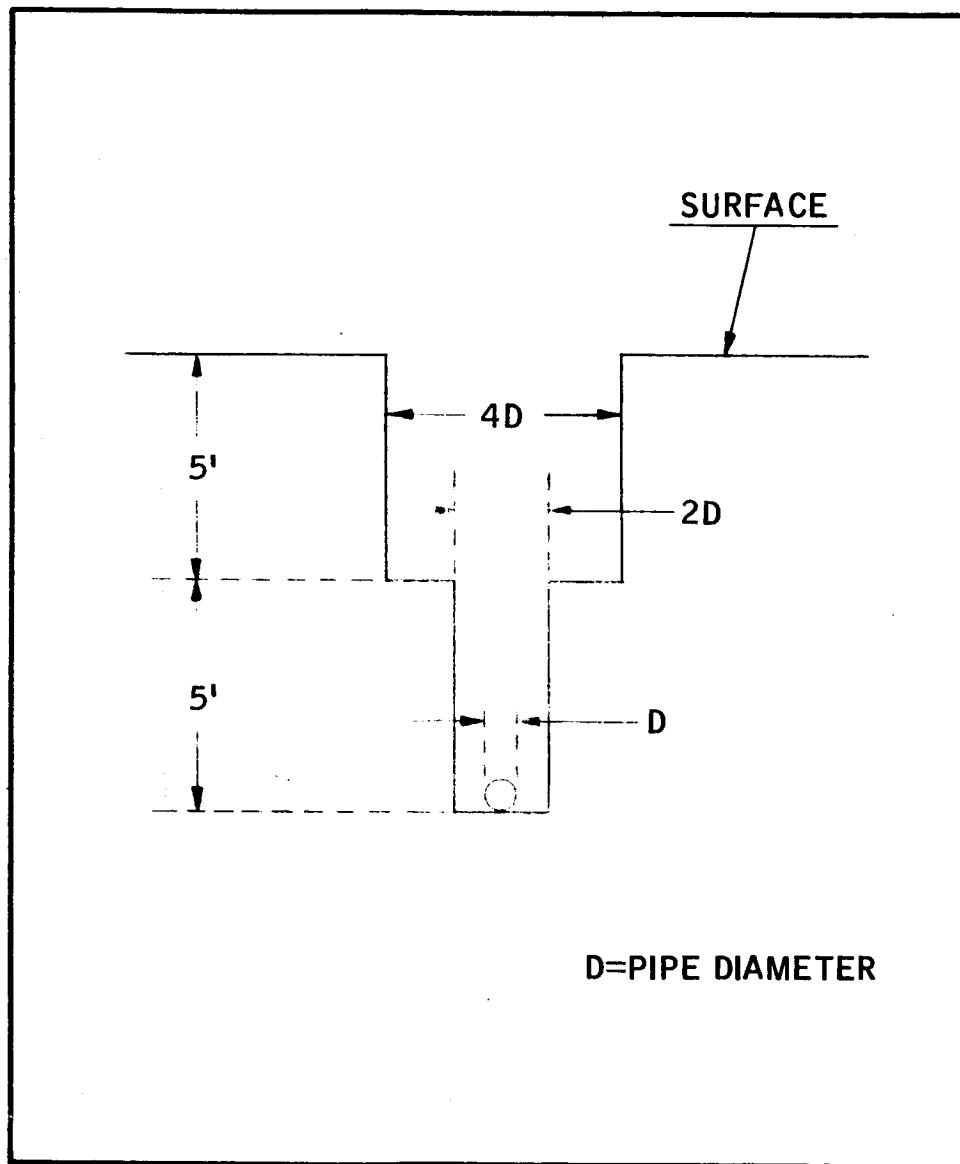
Dimensions for Pipe Trench 10 Feet Deep
